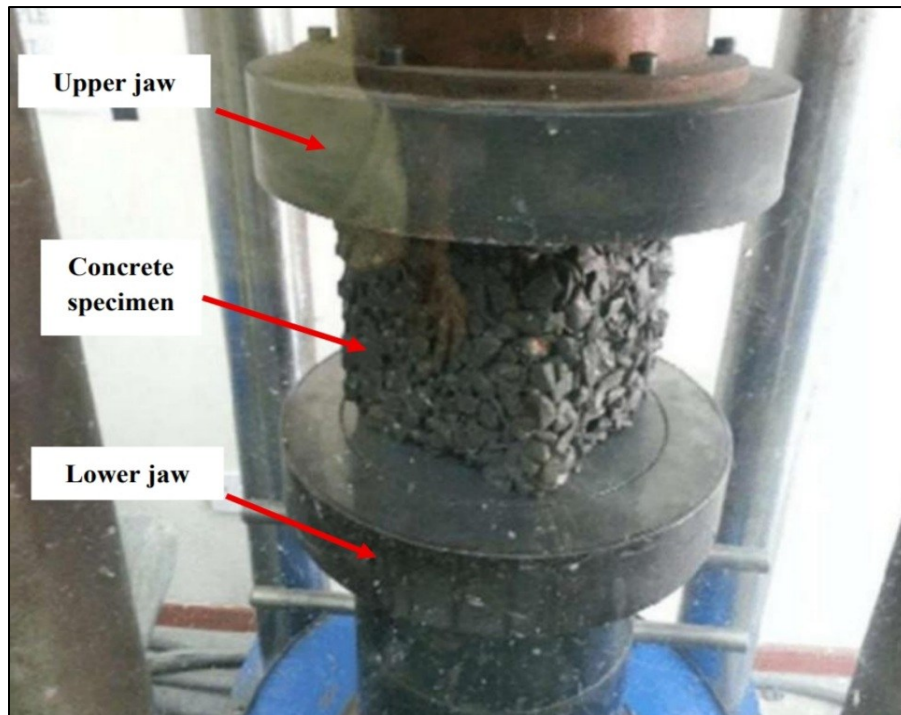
Pervious concrete specimen under automatic compression testing machine with load capacity of 1000 kN
